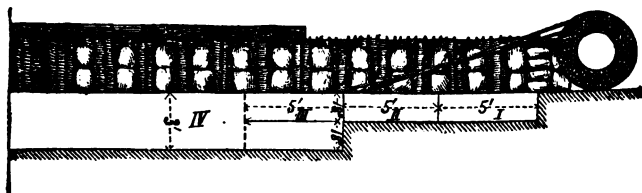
SECTIONAL ELEVATION OF KNEELING SAP.
